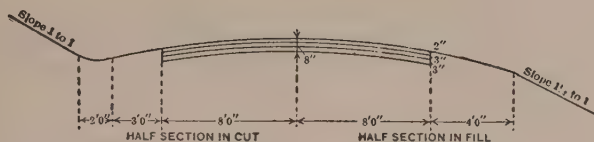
Cross-section Gravel Road. Connecticut State Highway Department.
